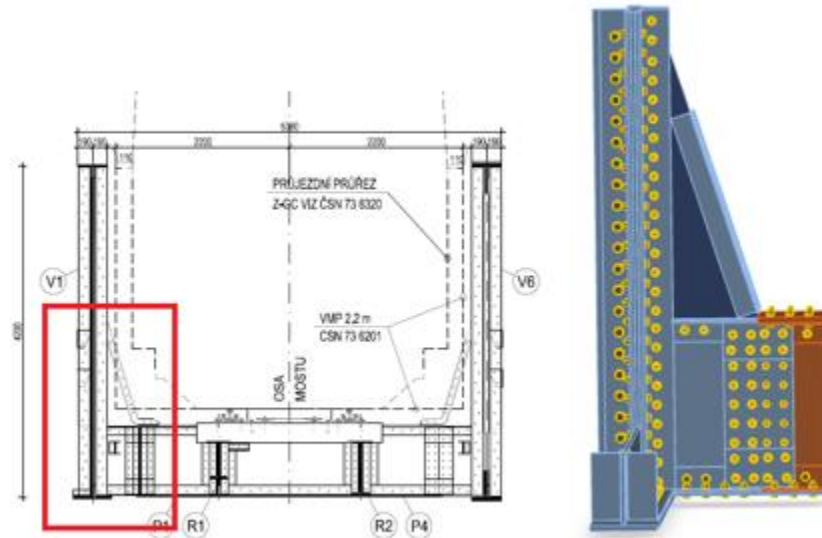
Joint of interest on TU 2101. Main girder with the cross beam. Ref. [16]
